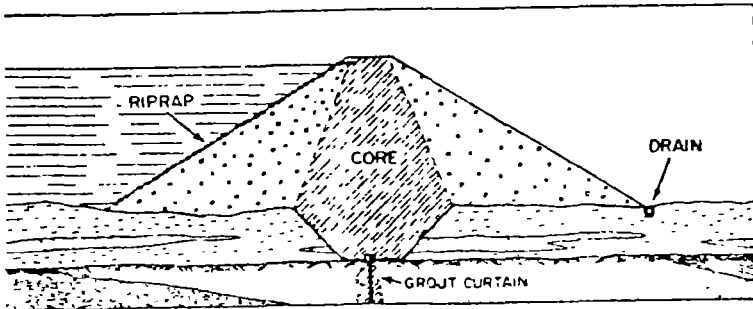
and 26 illustrate the use of grouting in earth dam construction.
